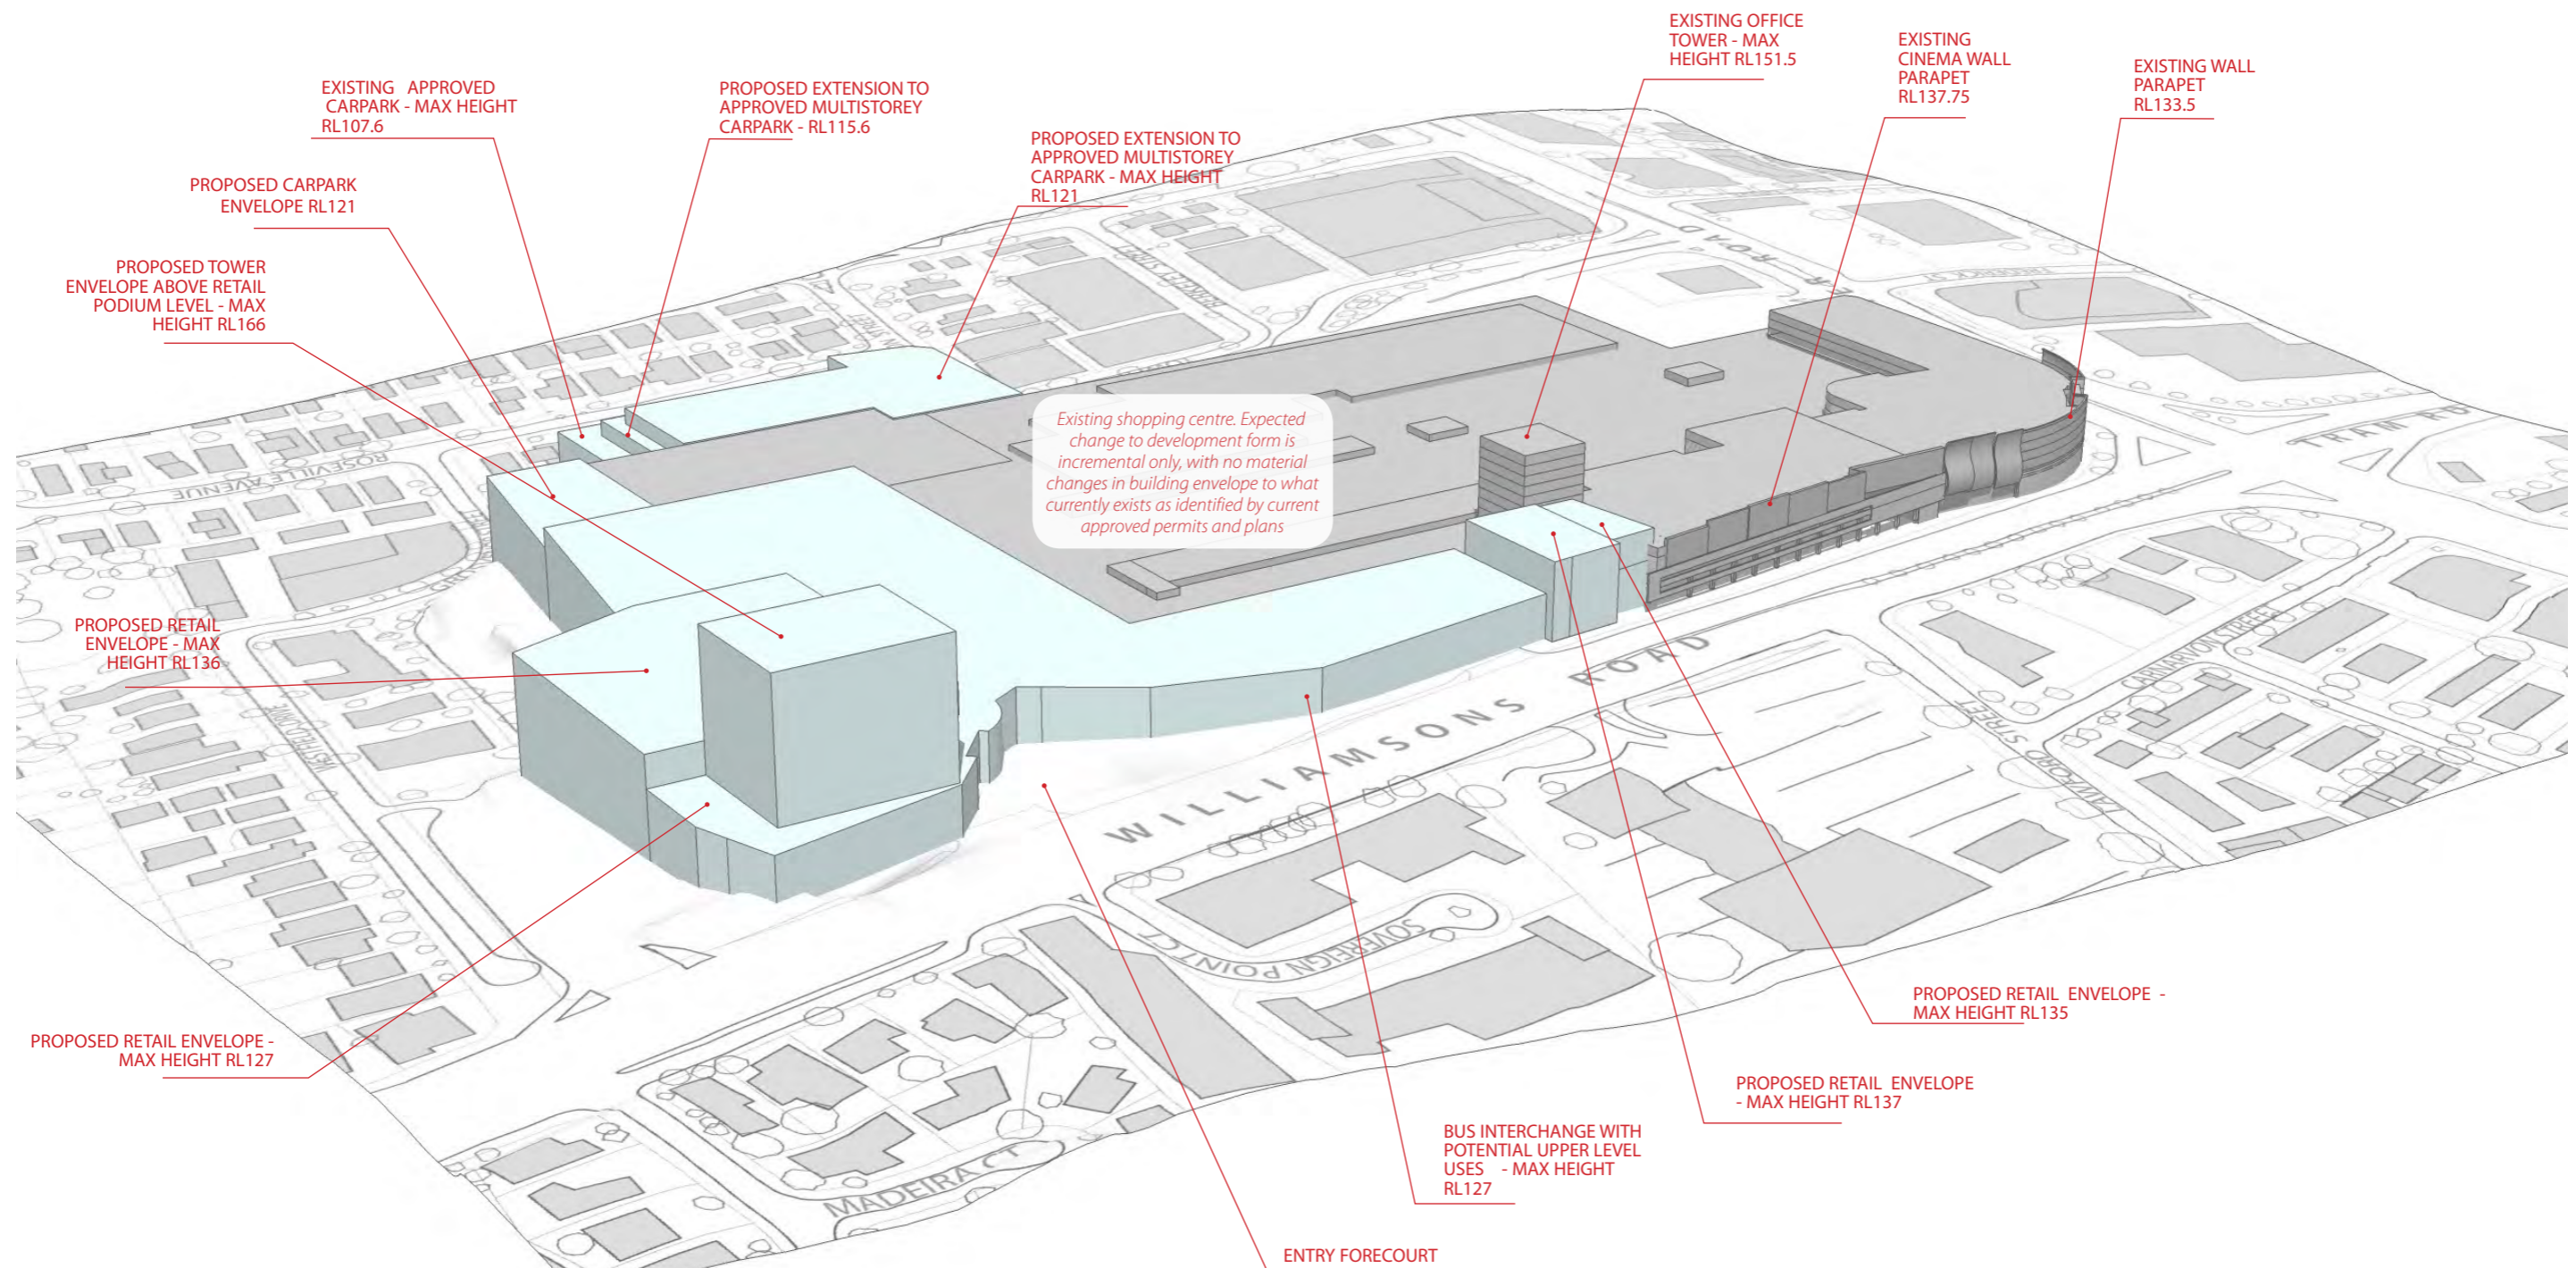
Perspective view of Indicative envelope plan, looking north-east across the site
